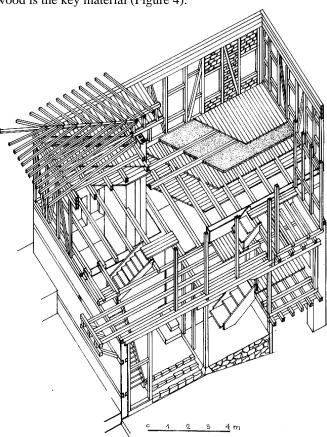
Sabura's house, structure of the building Source: Author (Drawing, 1984.)
